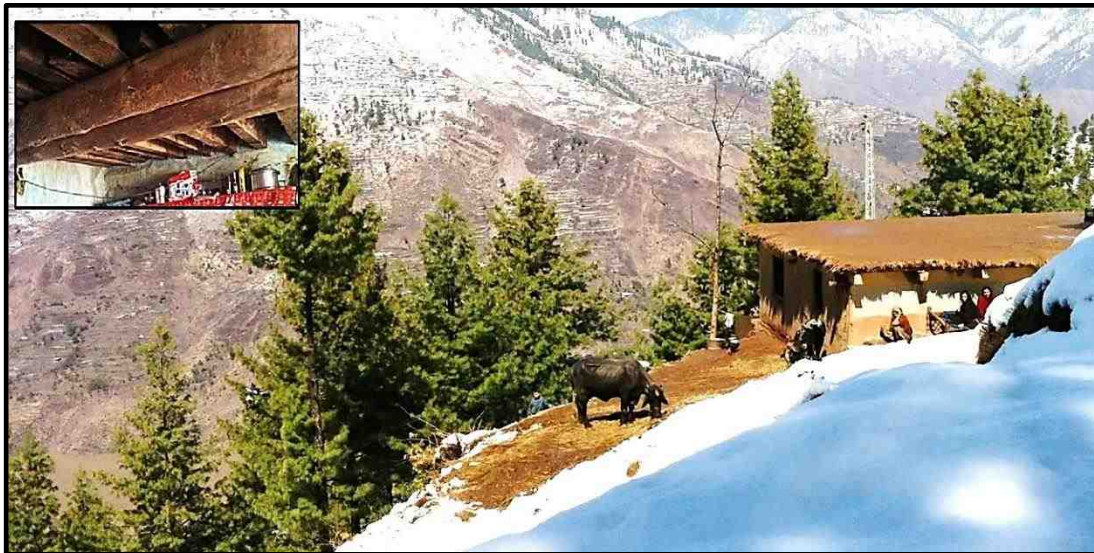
A rural kacha house in Salmia (Muzaffarabad), flat mud roof (saturated with water) and steep slope can be noticed (inset: whole tree trunks as roof beams).
